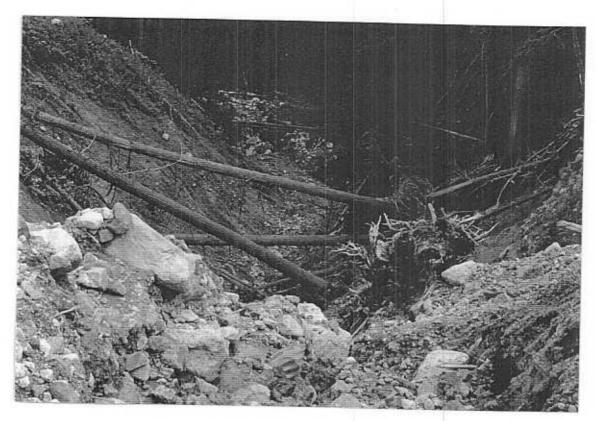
Landslide track looking downslope towards Hound Creek. Note culvert remanants in the forground.
